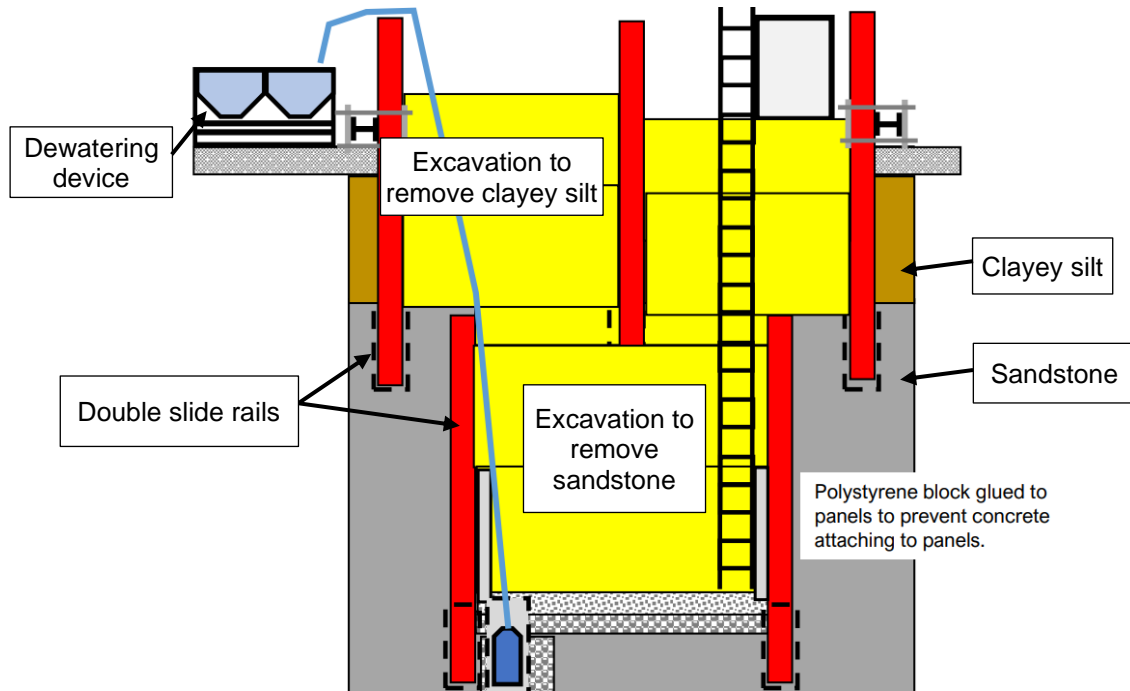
Staged excavations to install pump station inlet manhole and wet well components
